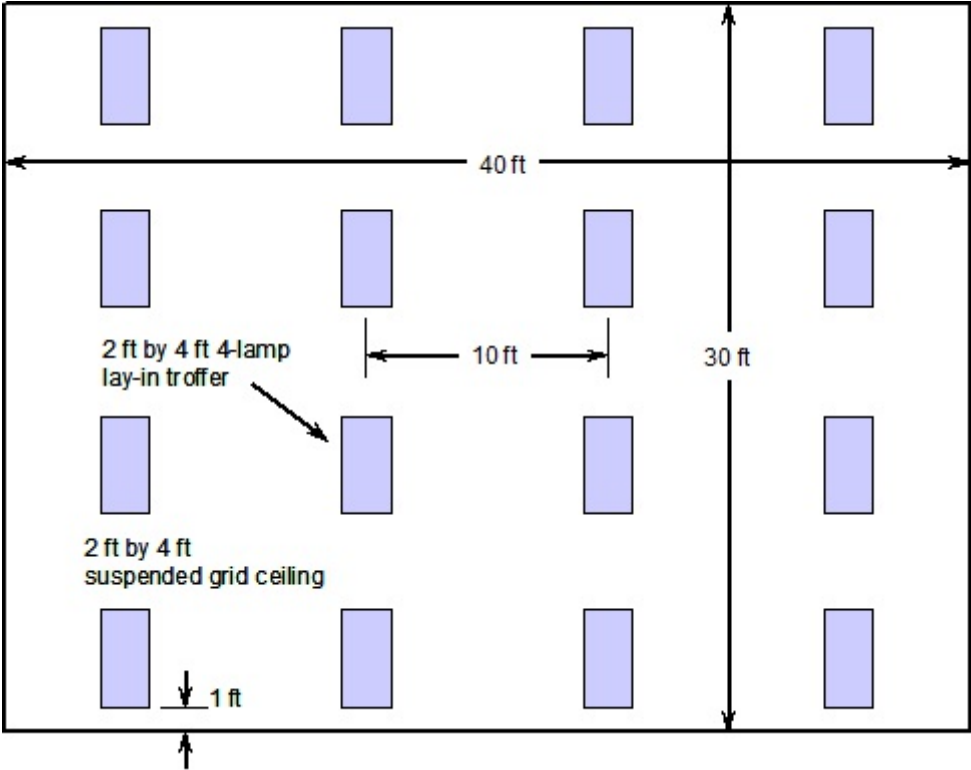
When laying out the luminaires for a room, consider the spacing to mounting height ratio to prevent dark areas in the room. When mounting luminaires in a suspended ceiling grid, the grid layout will be an additional constraint that must be considered in the layout.
